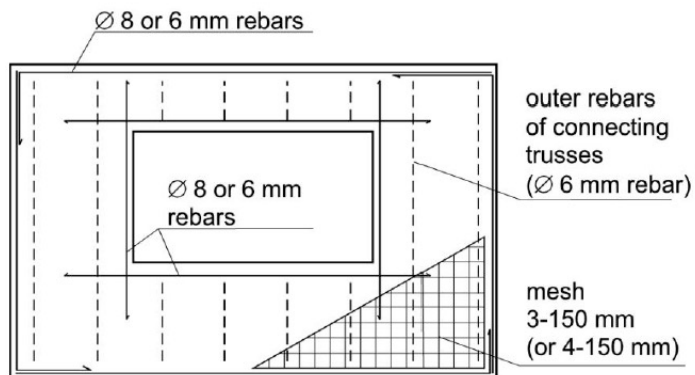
Typical reinforcement of outer layer of a concrete (1998).
